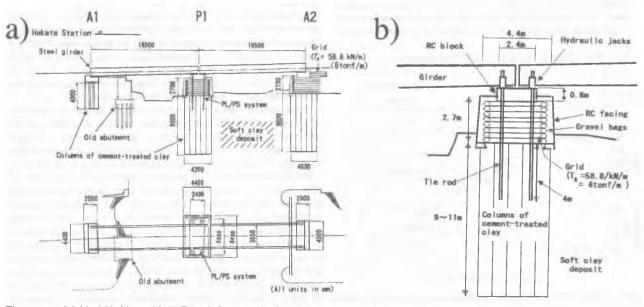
a) Maidashi bridge with PLPS reinforced soil pier at the center; and b) details of the pier
